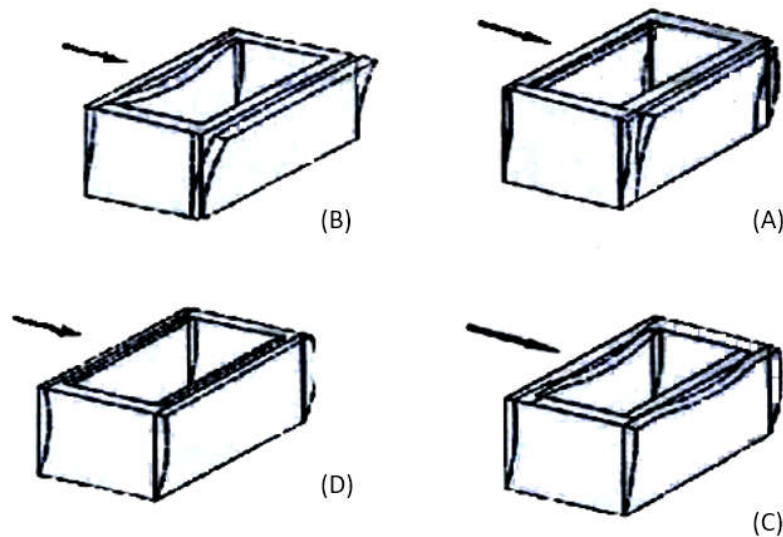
Vibration in buildings with masonry, gestures during an earthquake: A and B - structural walls, are not close to each other, c - structural walls, have been closed to each other, the coil, D - structural walls with solid concrete slab, have been closed to each other, the ceiling [1,7,8]
